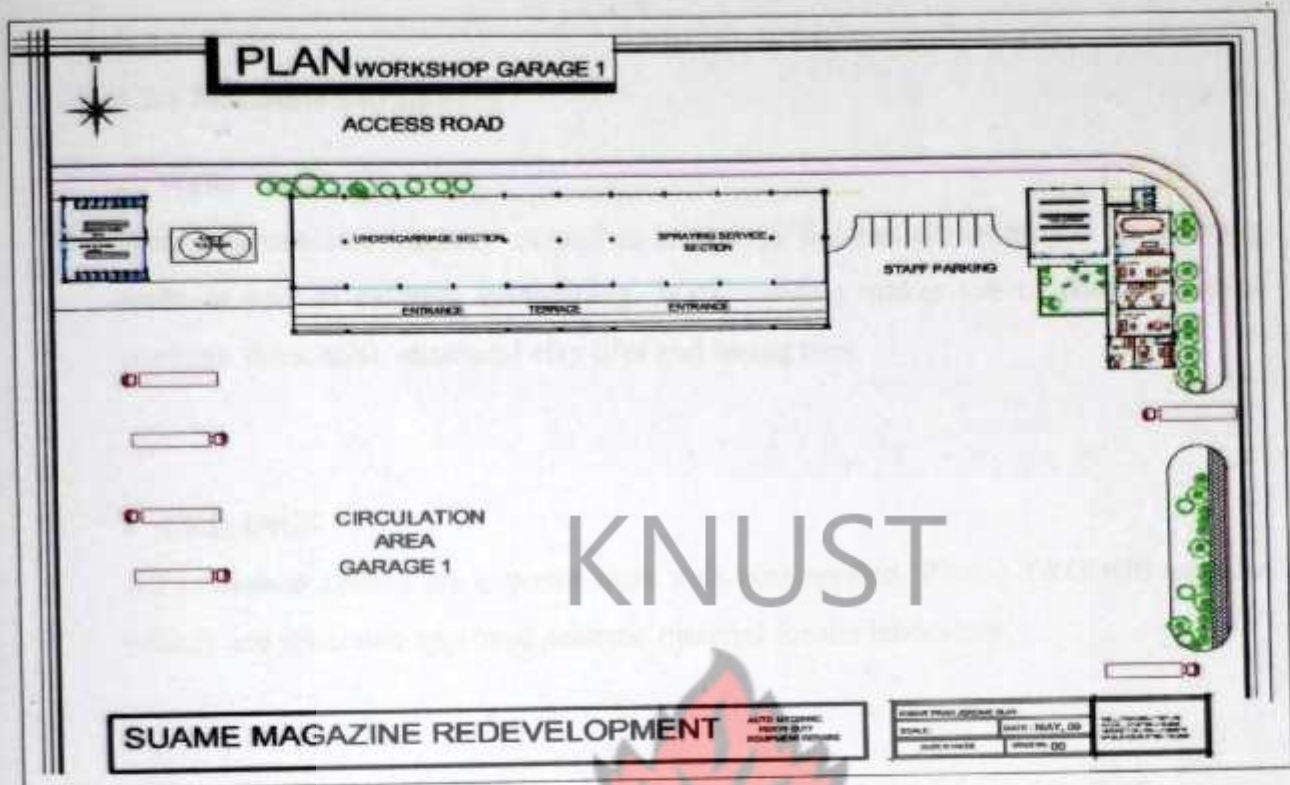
shows workshop 1 the administration ,entrance to the garage, undercarriage section and spraying section.
